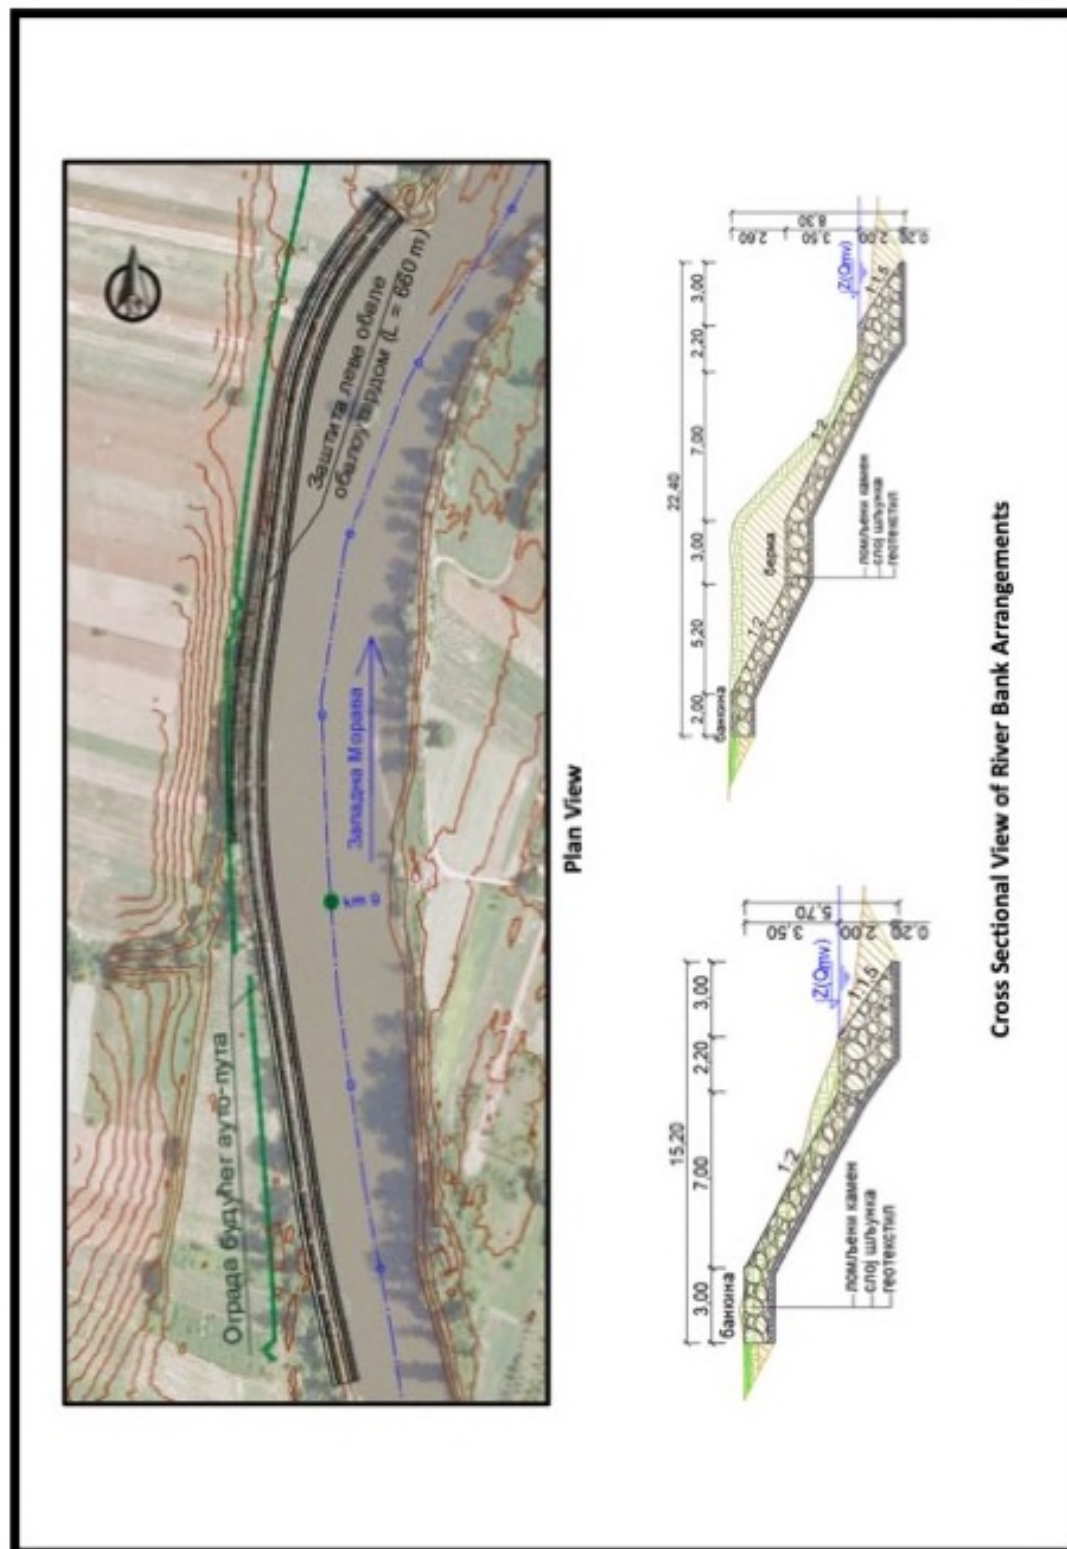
The route and typical cross-section of the Structure 2, Section-1
